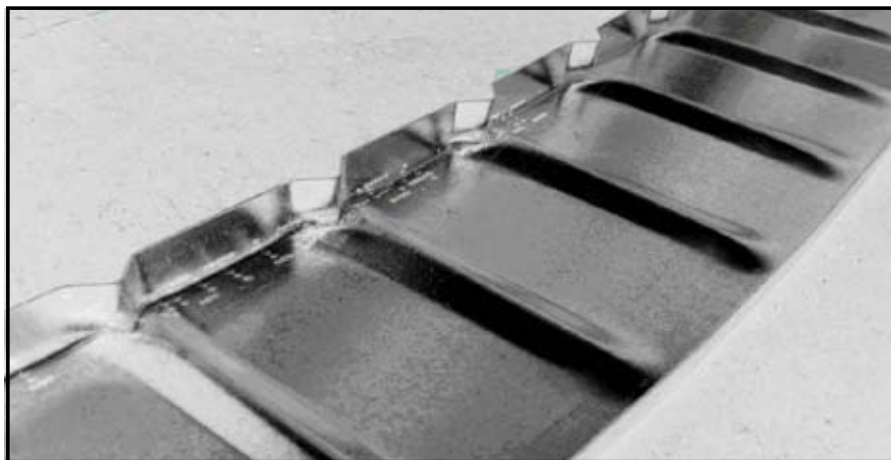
Photo of a section of the crimped bottom wall plate, showing “cells”.
